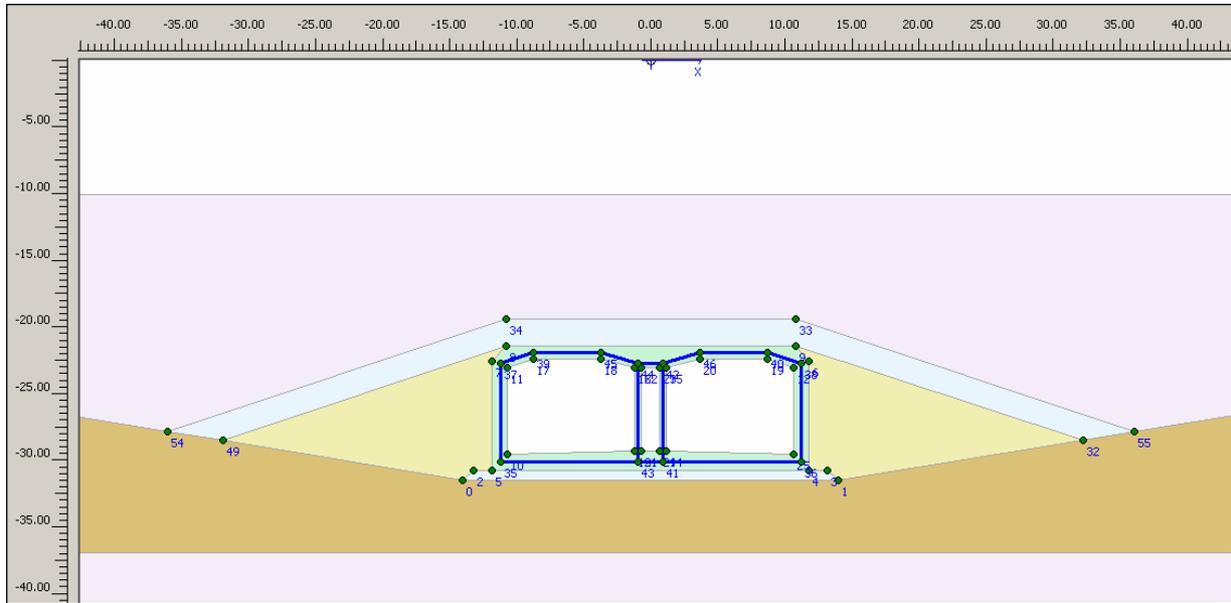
An example of the tunnel profile as modelled in PLAXIS
